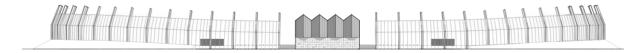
Pavilion Building (Proposed Revised Scheme)
